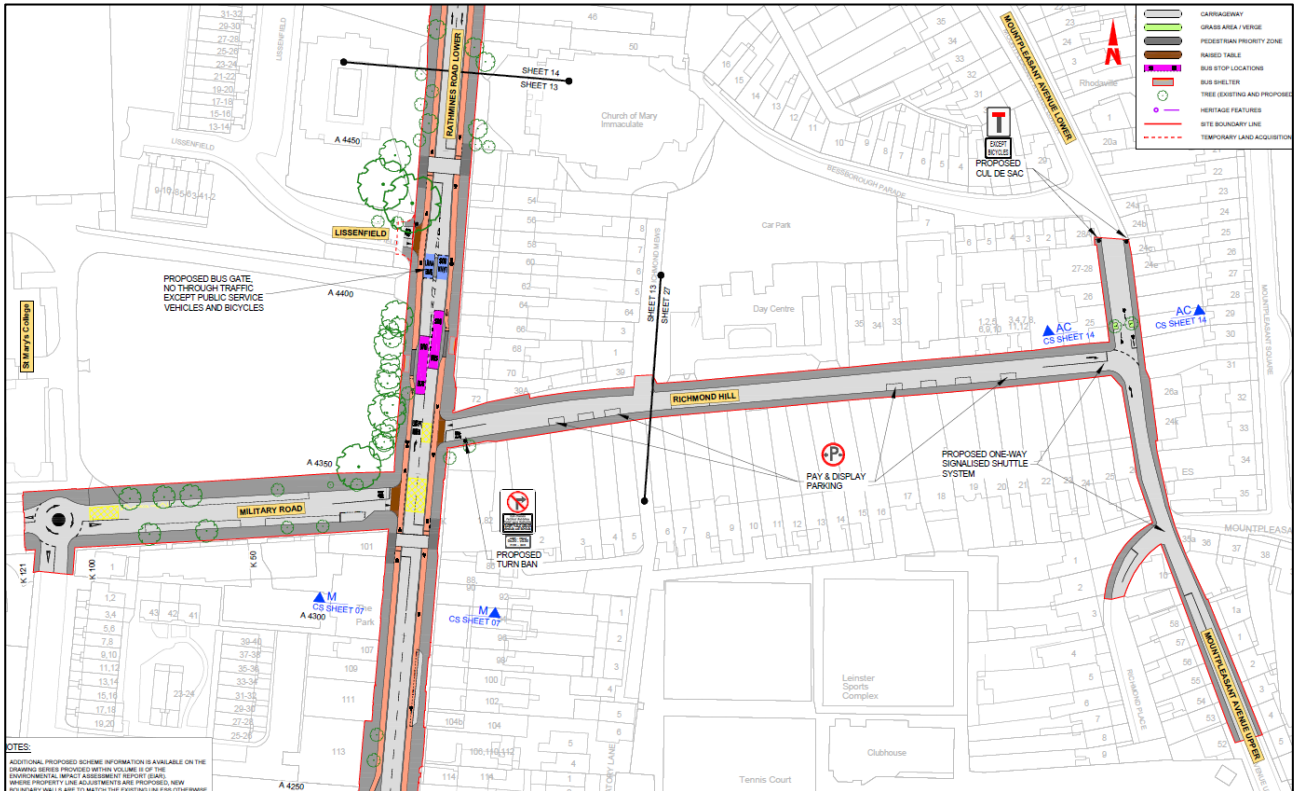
Extract from General Arrangement Drawings (Sheet 27)
